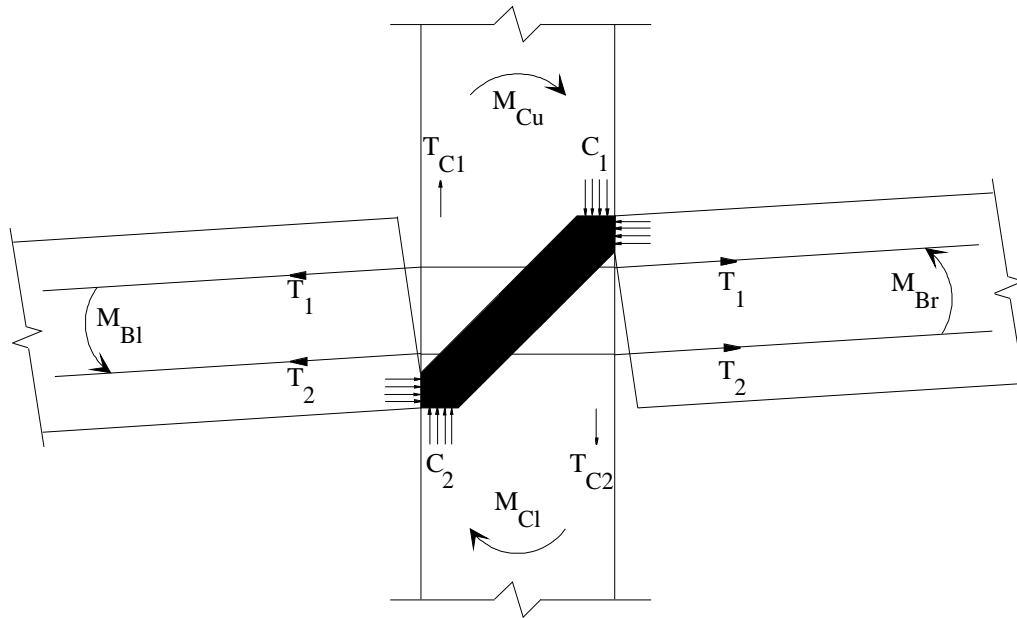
Joint Diagonal Compression Strut for Pretensioned Connection
